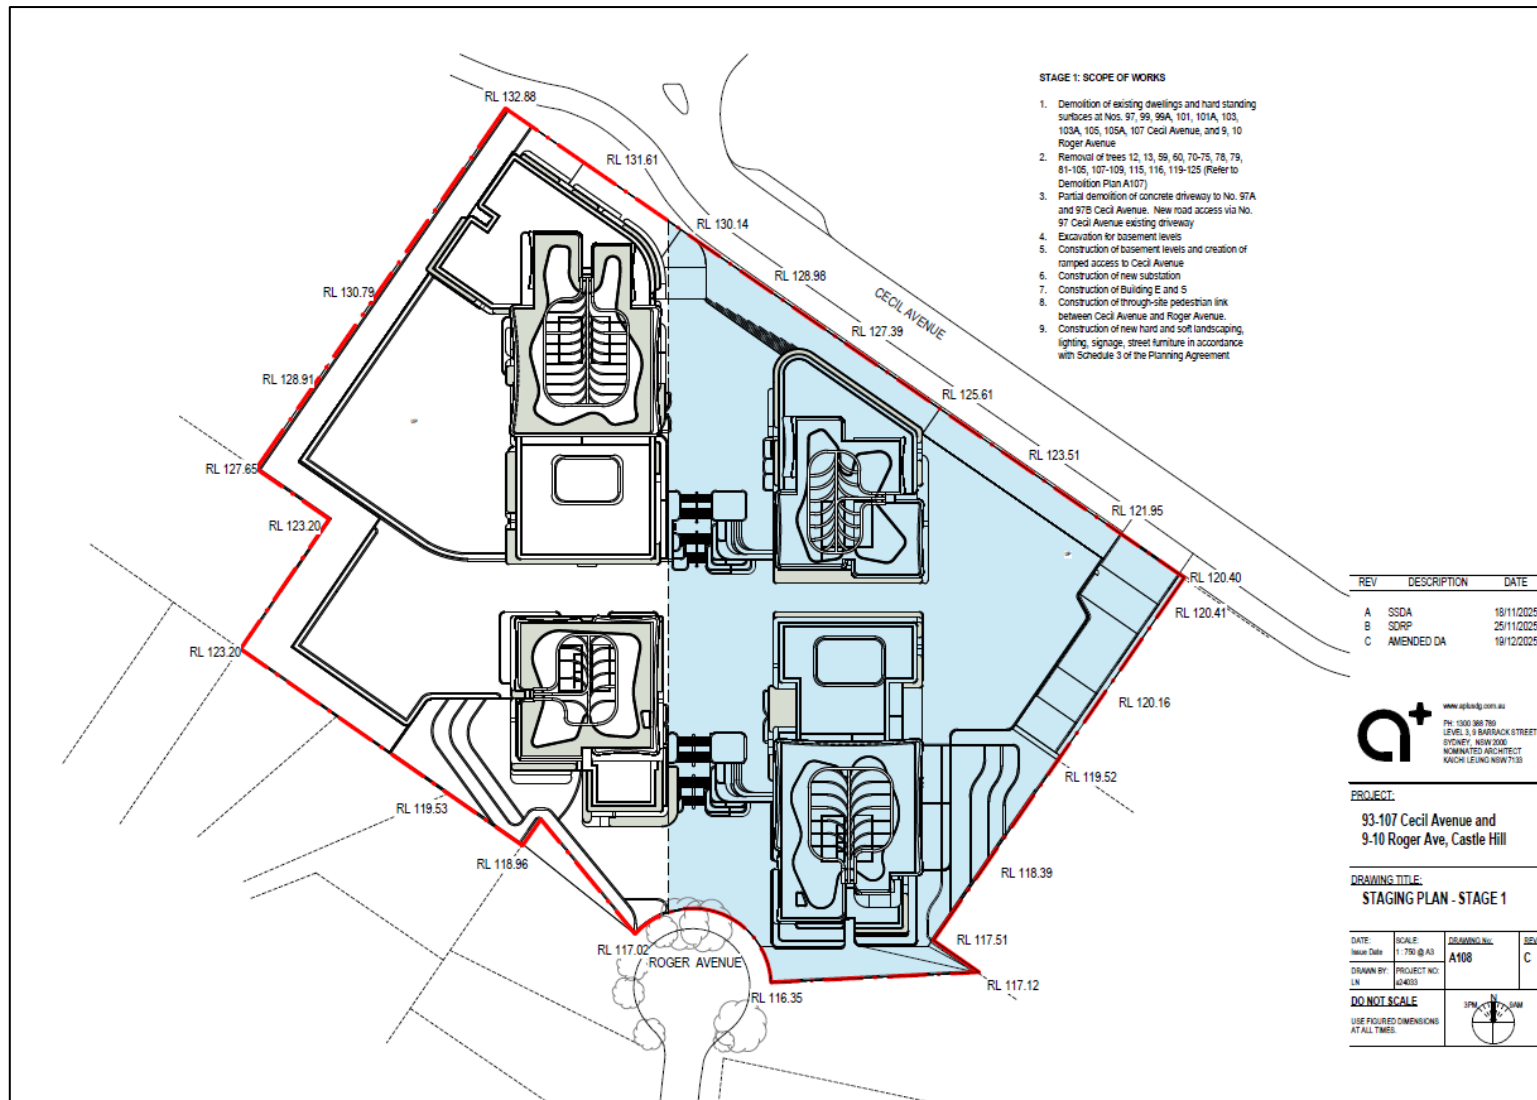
Staging Plan depicting overall building layout (Source: Alton Property Group, November 2025)
